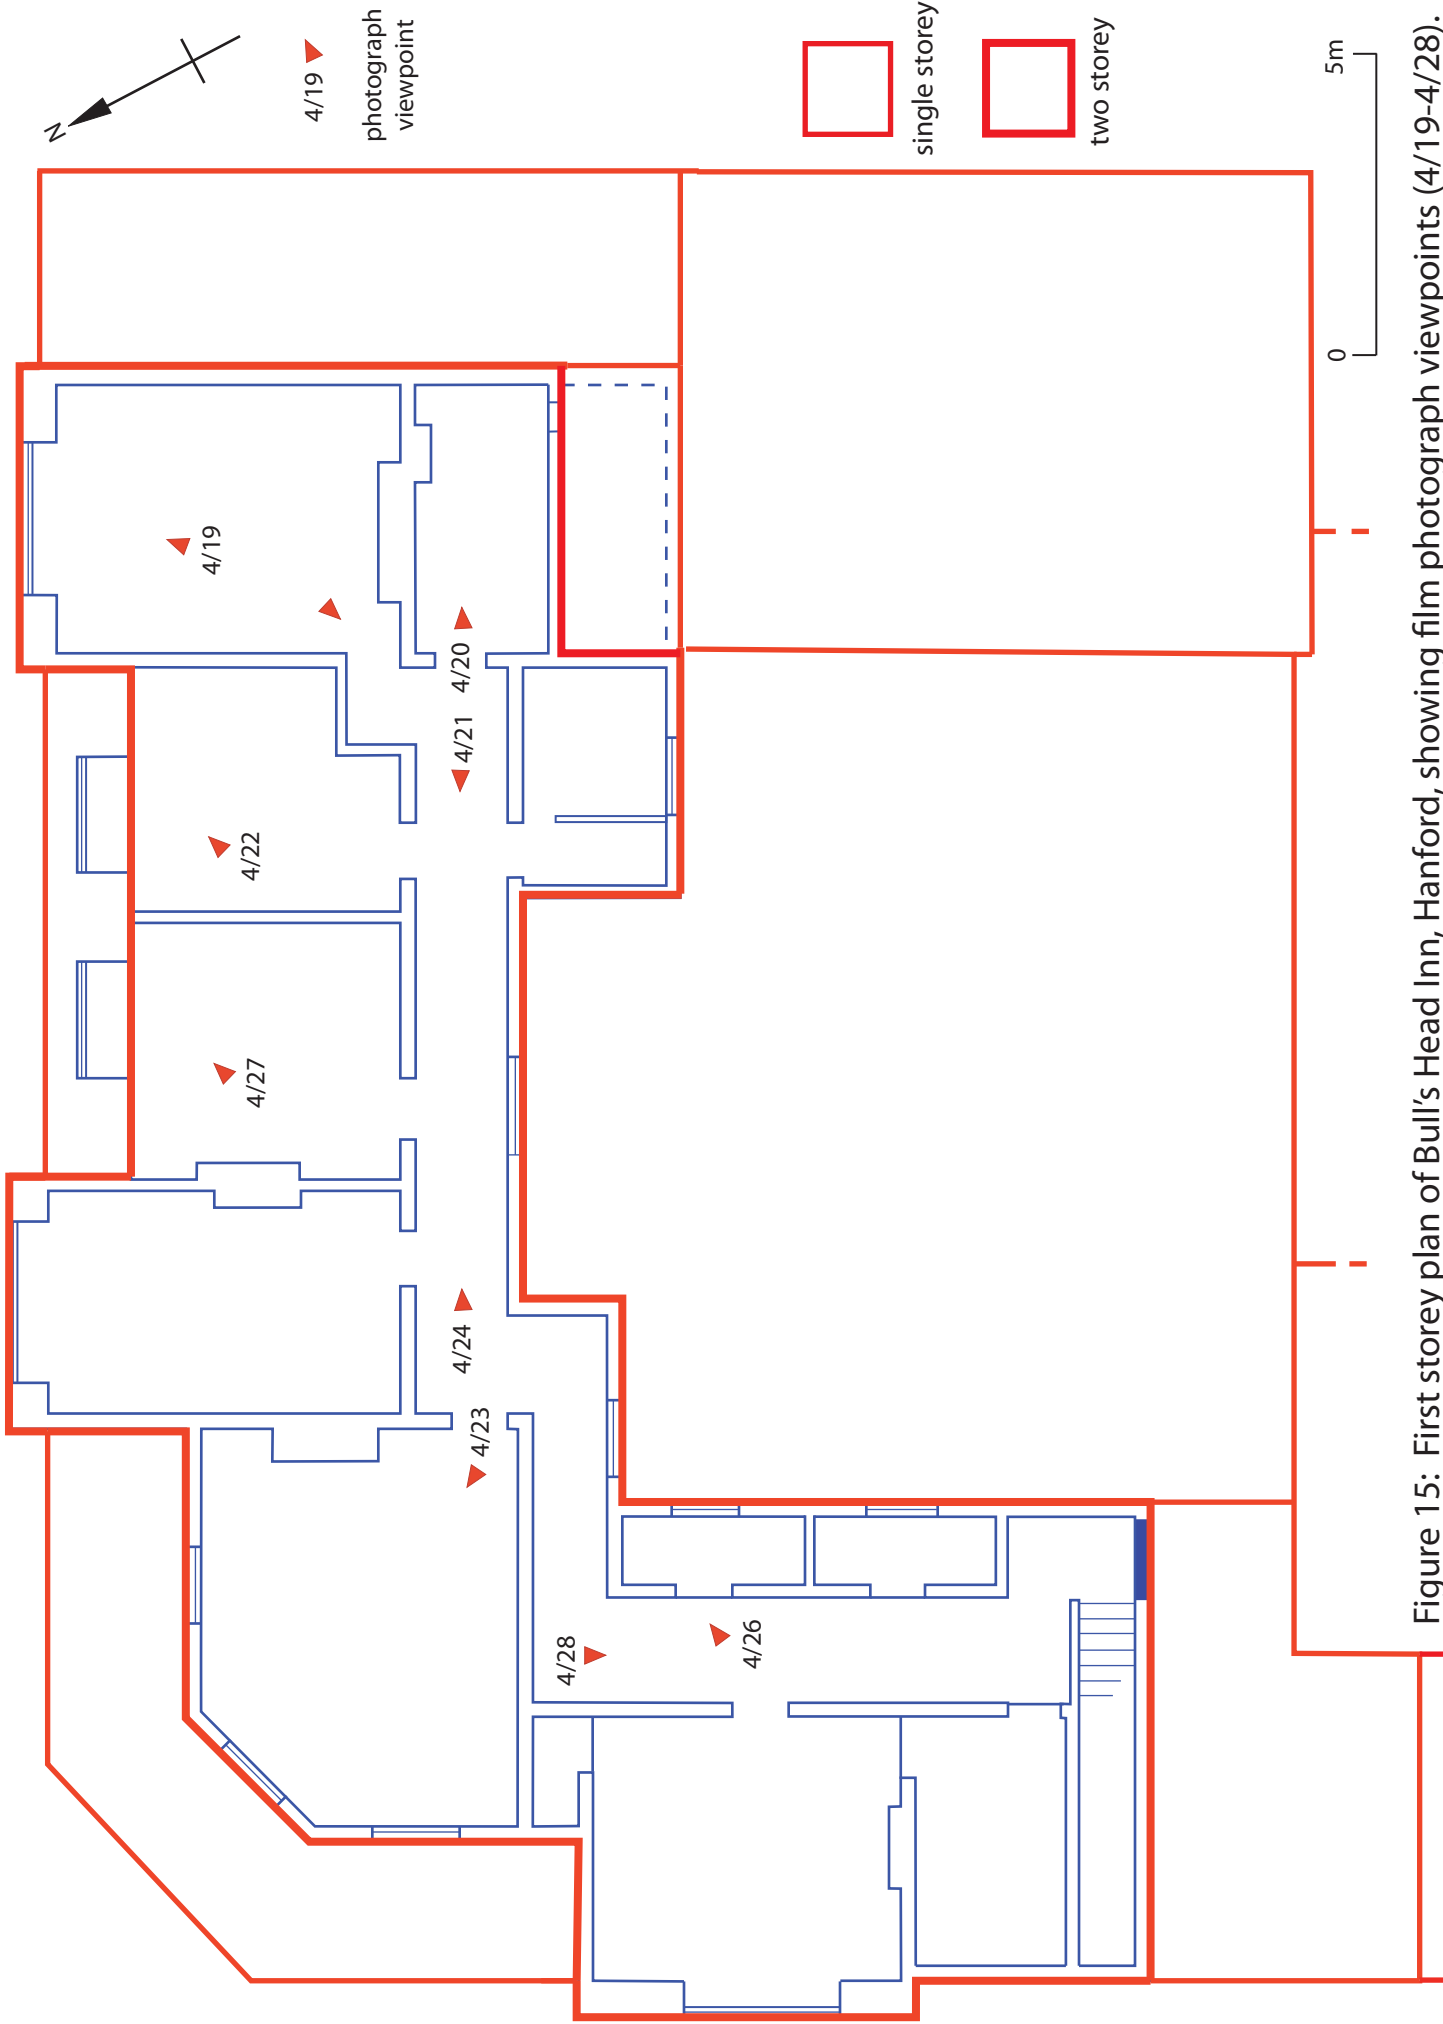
First storey plan of Bull's Head Inn, Hanford, showing film photograph viewpoints (4/19-4/28).
